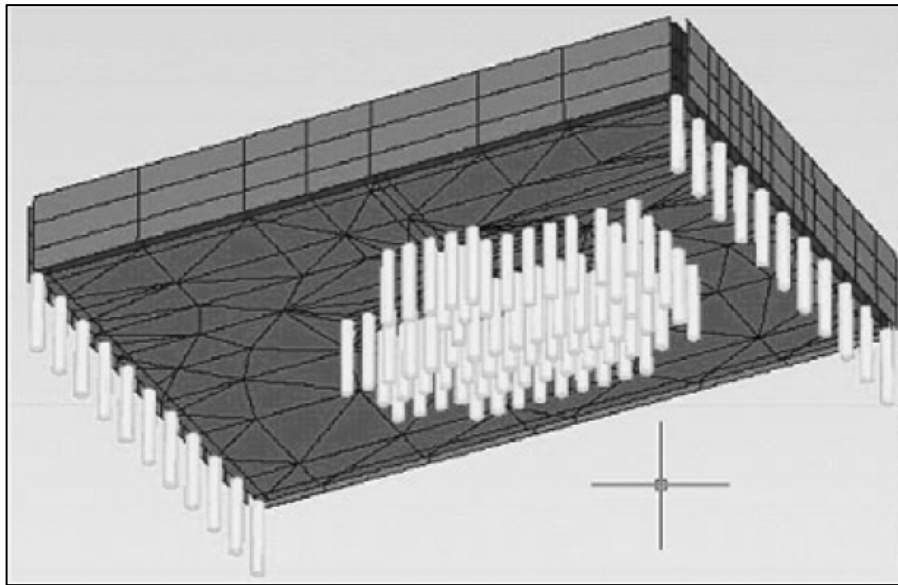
Final pile arrangement (Khoury et al., 2011)
